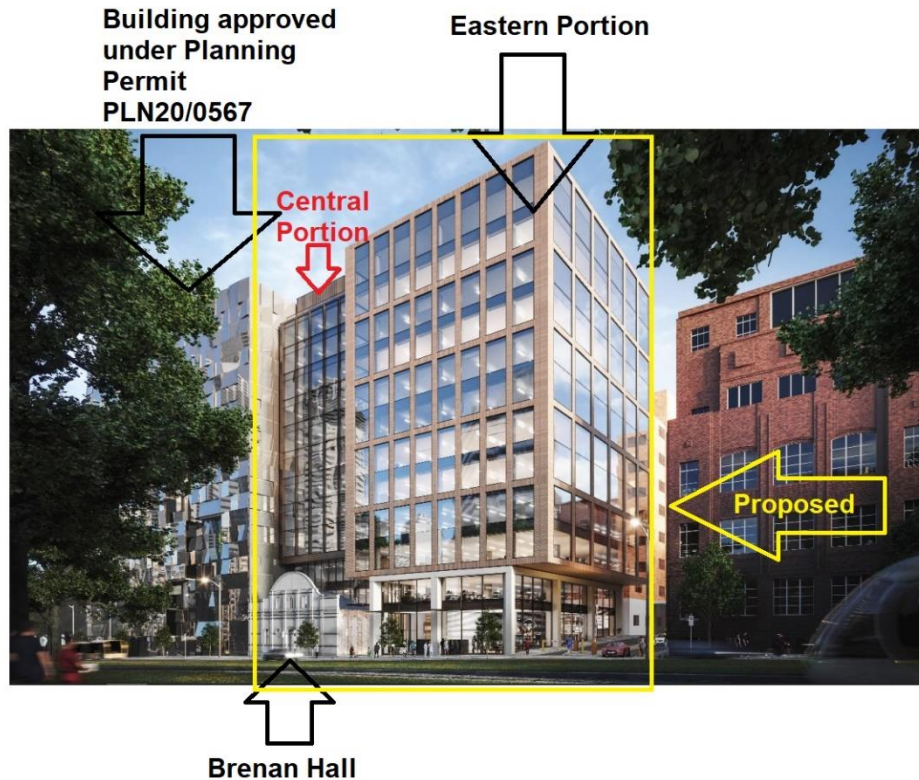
Proposed Victoria Parade elevation / render showing the building at the approved building at the Nicholson Street and Victoria Parade intersection.
